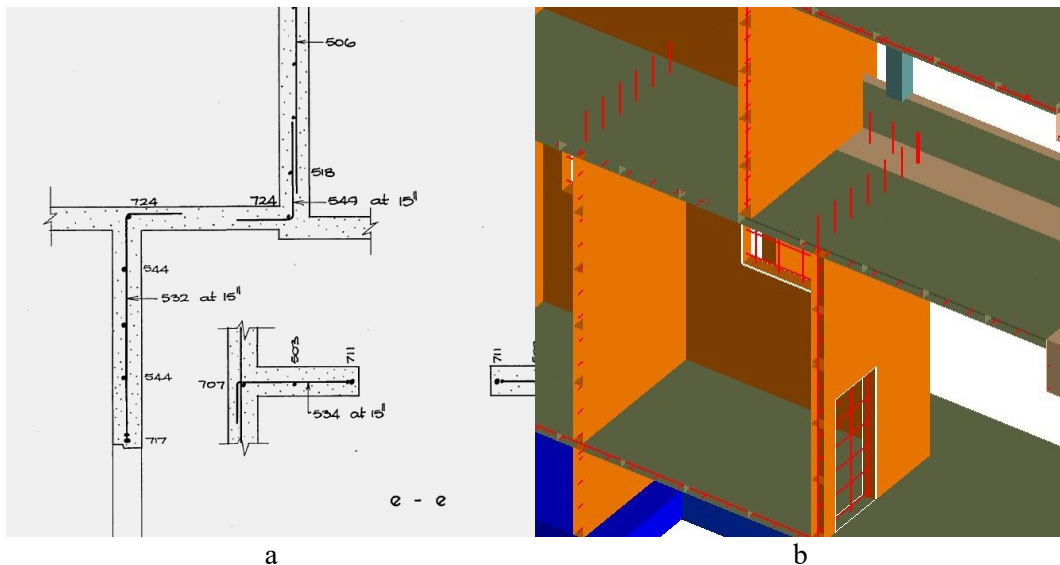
Vertical offset in the shear core wall, original drawings (a), and numerical model (b).
